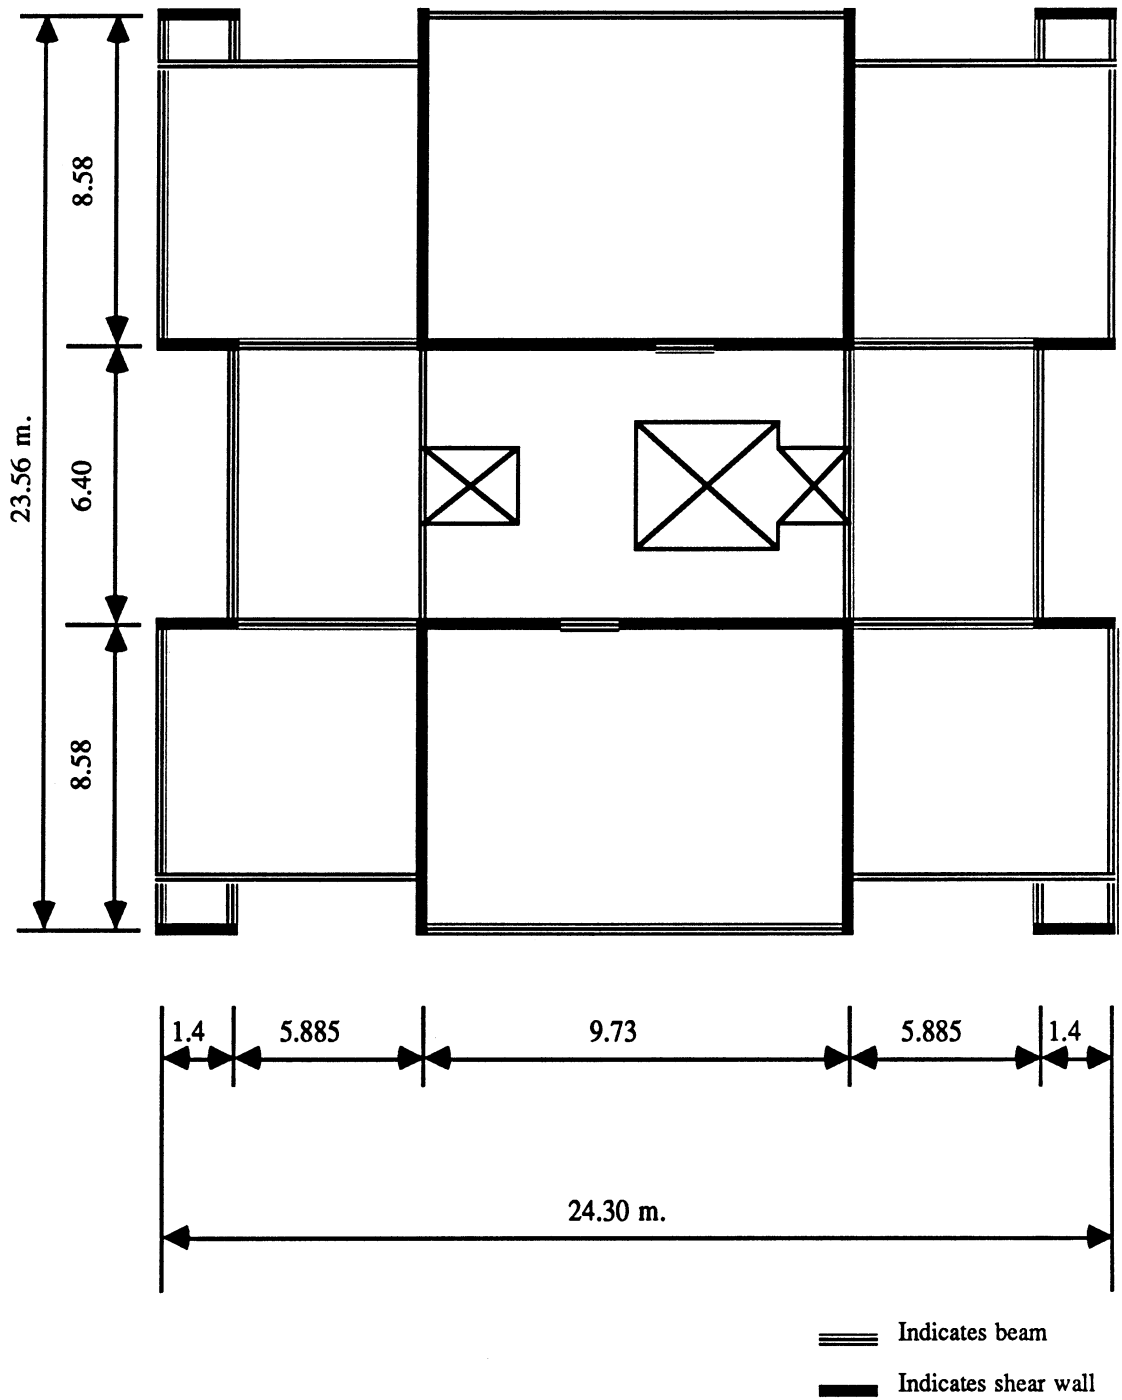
(a) : Plan View of a Typical Story of Almendral Building.
